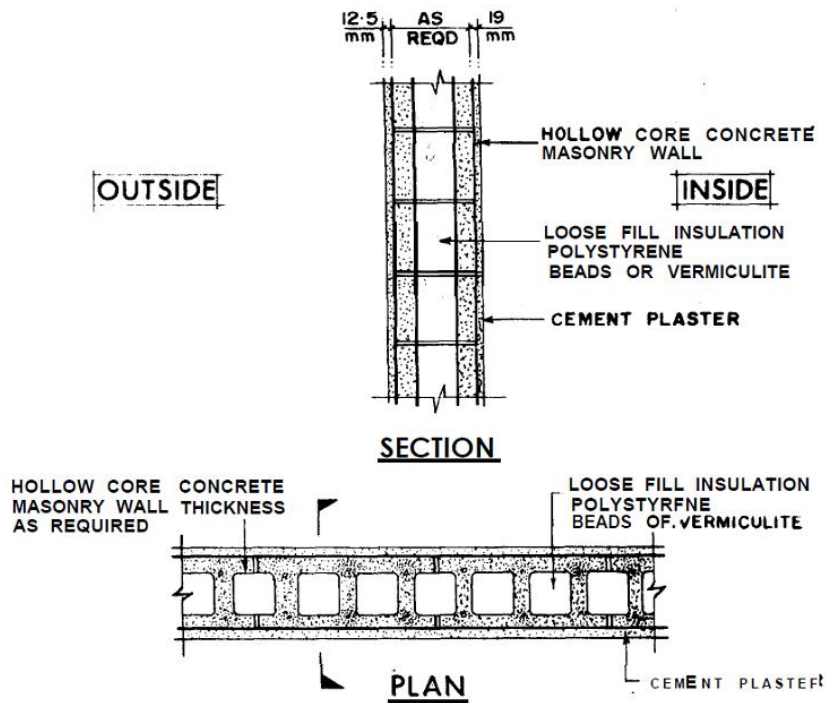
Hollow concrete block wall with loose fill insulation
